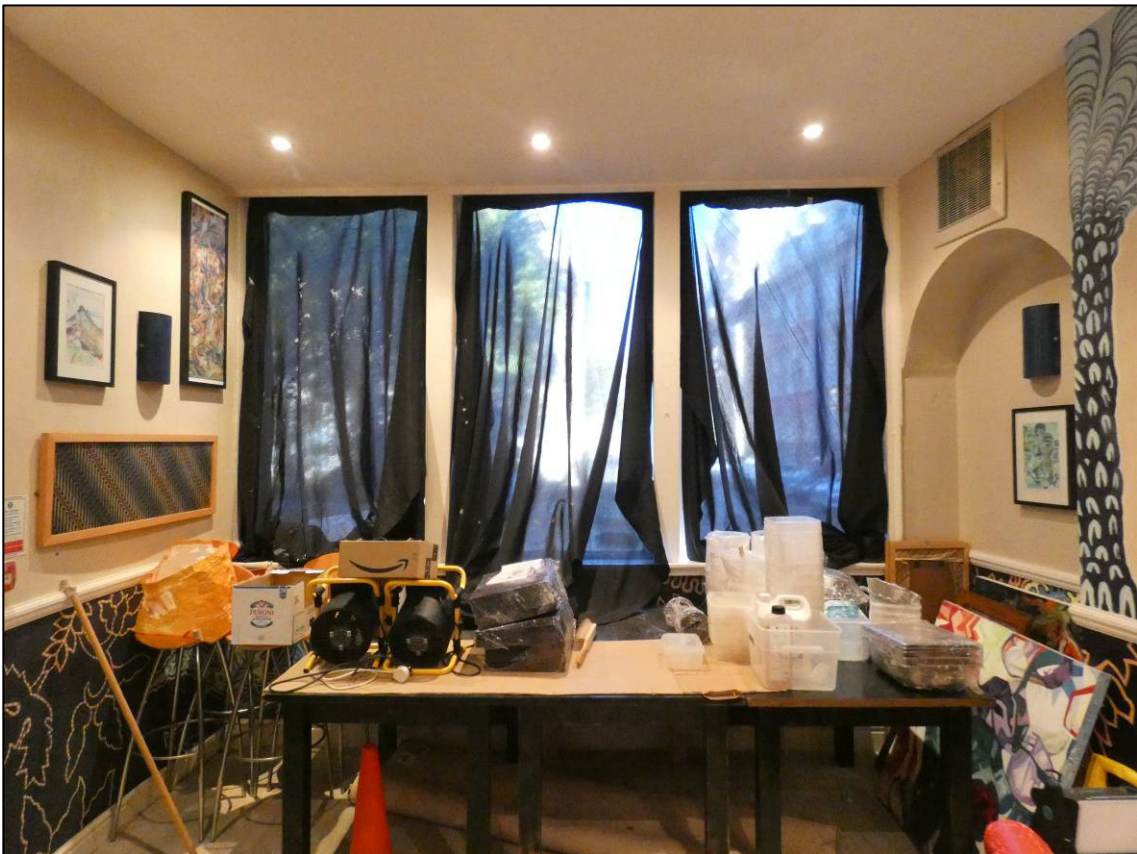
Room GF1, north wall, looking NW (photo 1/816).
